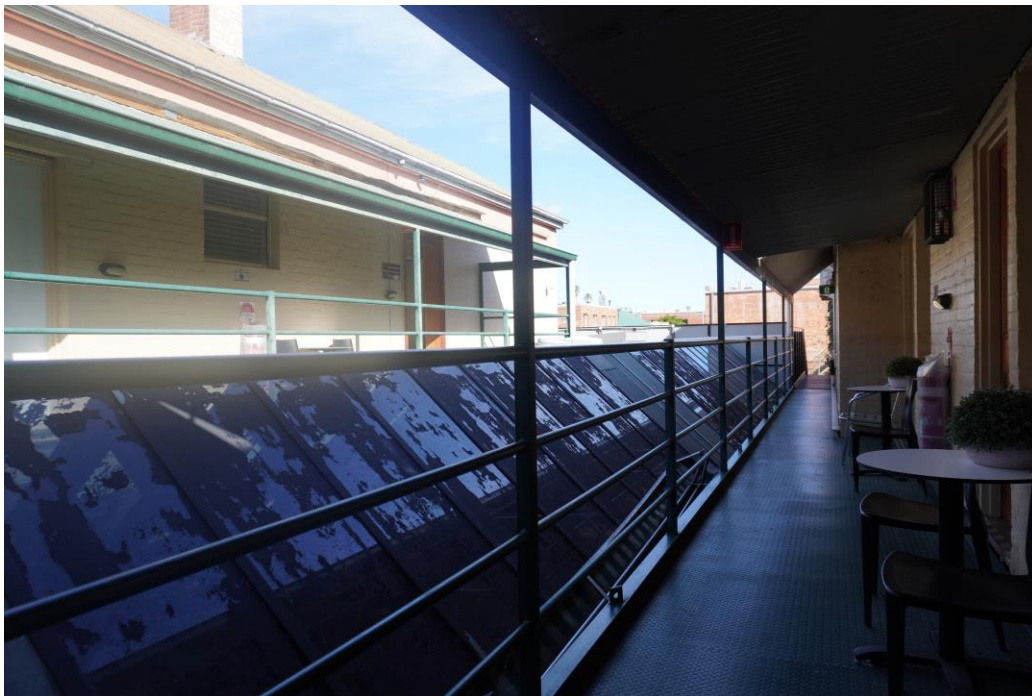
Skylight roof to be removed to allow better light and open the view of the upper floor fabric.
